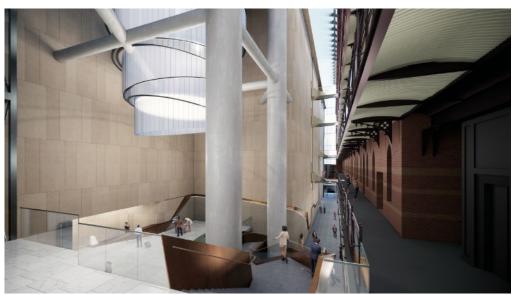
View from Collins Street entrance showing lowered office lobby - (Source: Cox Architecture)
